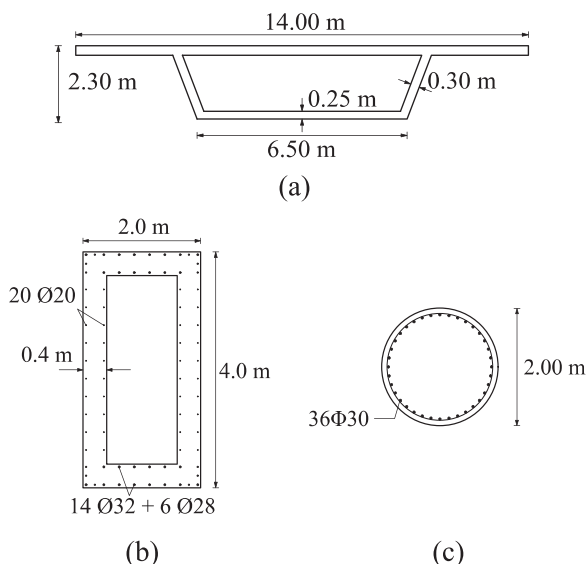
Geometrical characteristics of the bridge components: (a) deck cross-section; (b) hollow-core rectangular cross-section, and (c) circular cross-section of the piers.
